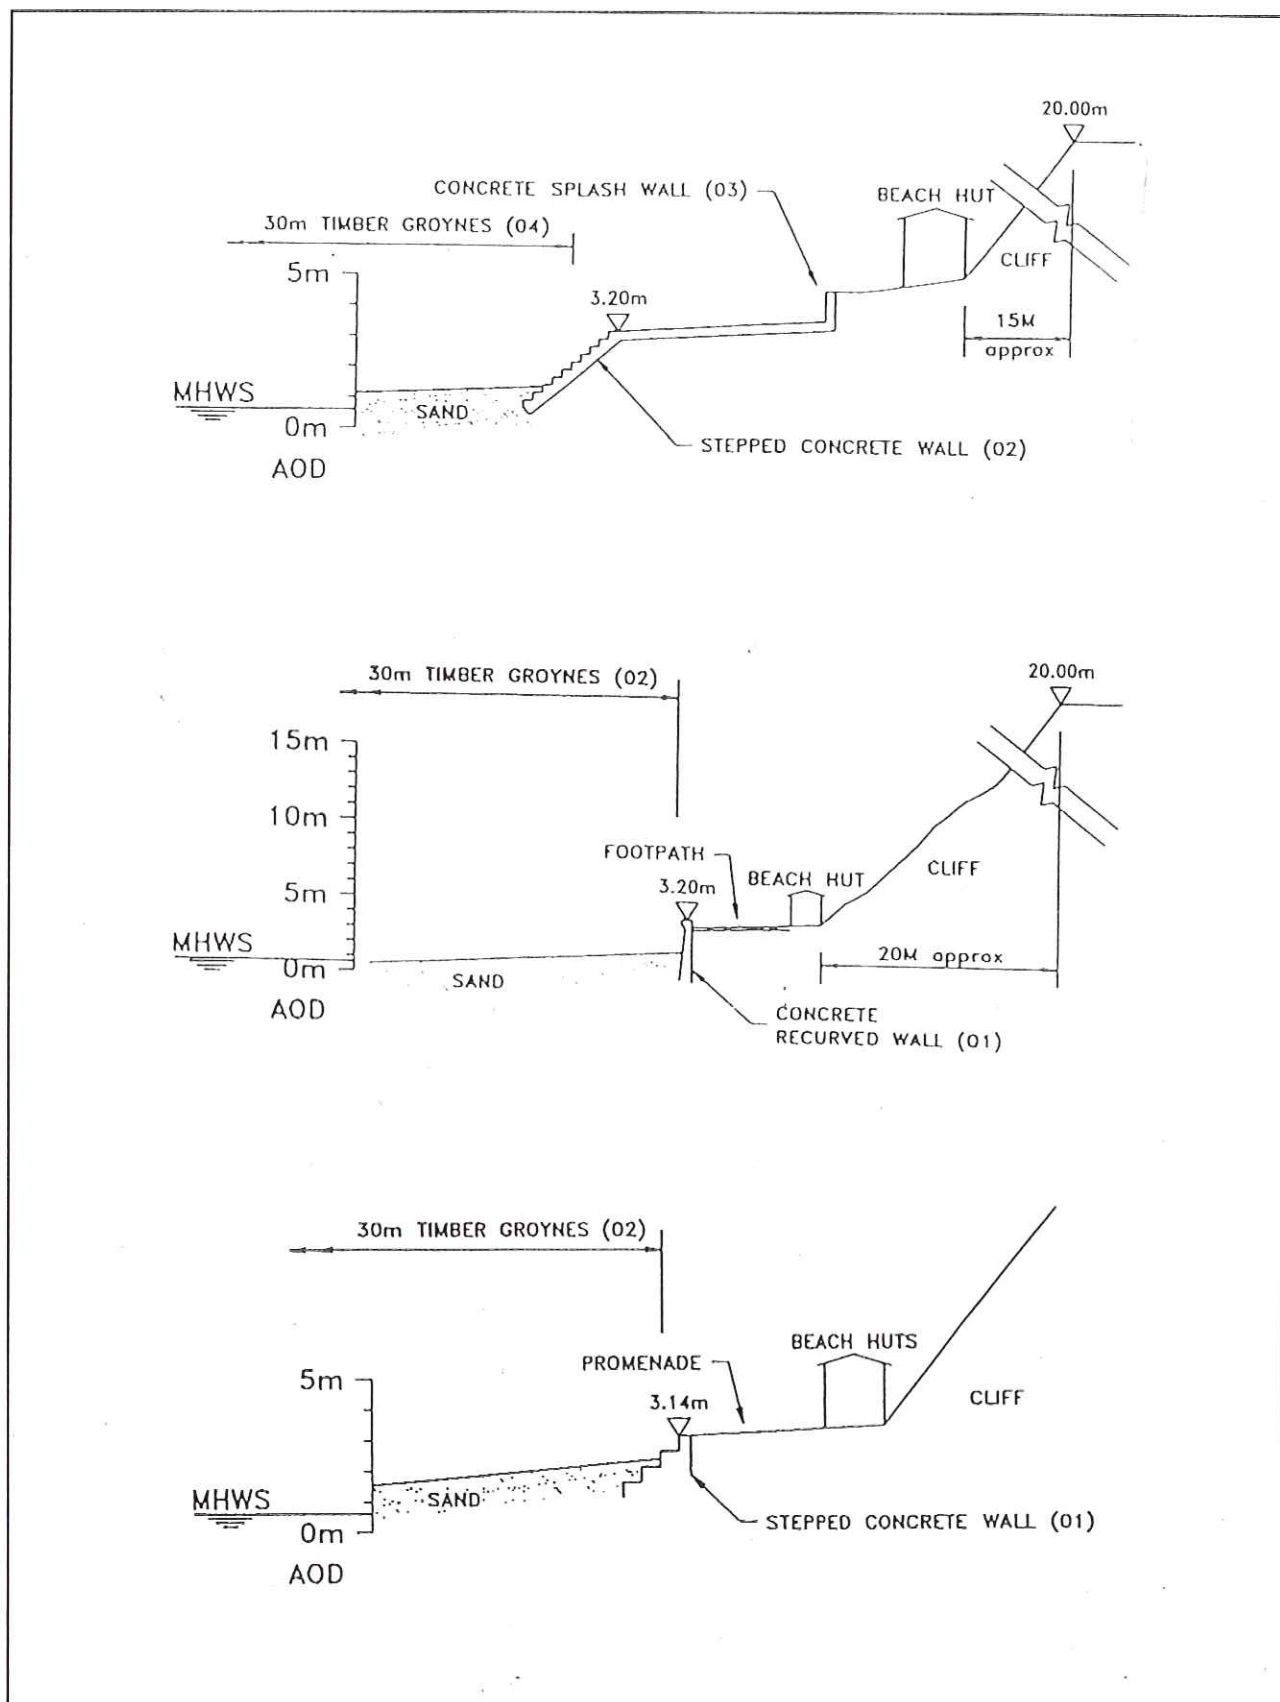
Seawall cross-sections 1/4, 1/6 and 1/8
